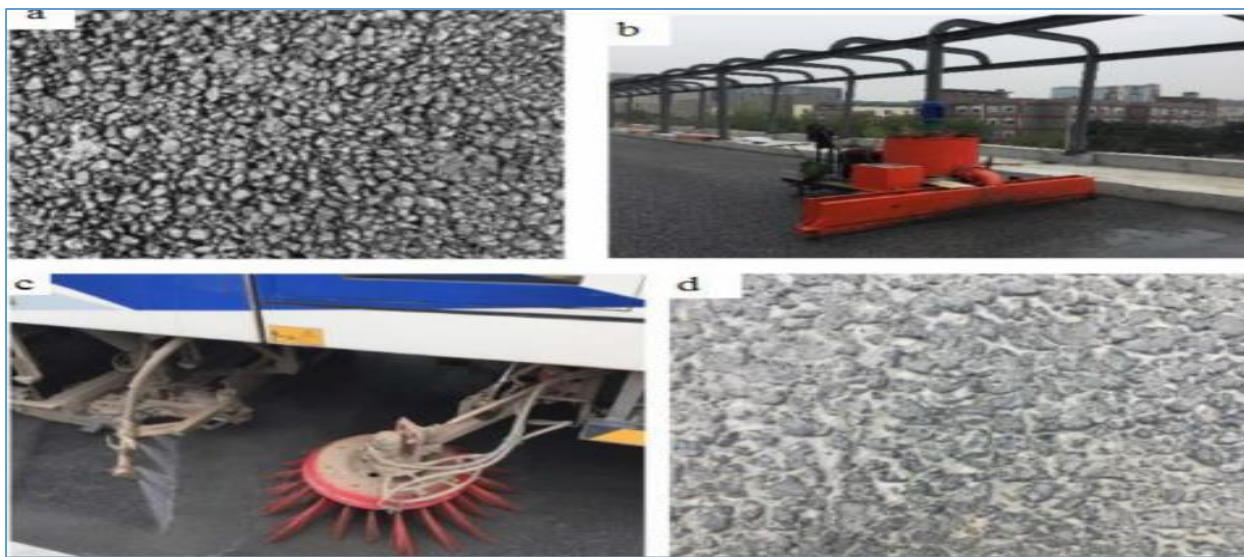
Construction of semi-flexible pavements in situ: (a) porous asphalt mixtures; (b) cement grout preparation; (c) cleaning of the pavement surface; (d) curing of the pavement surface (An et al., 2018) .
